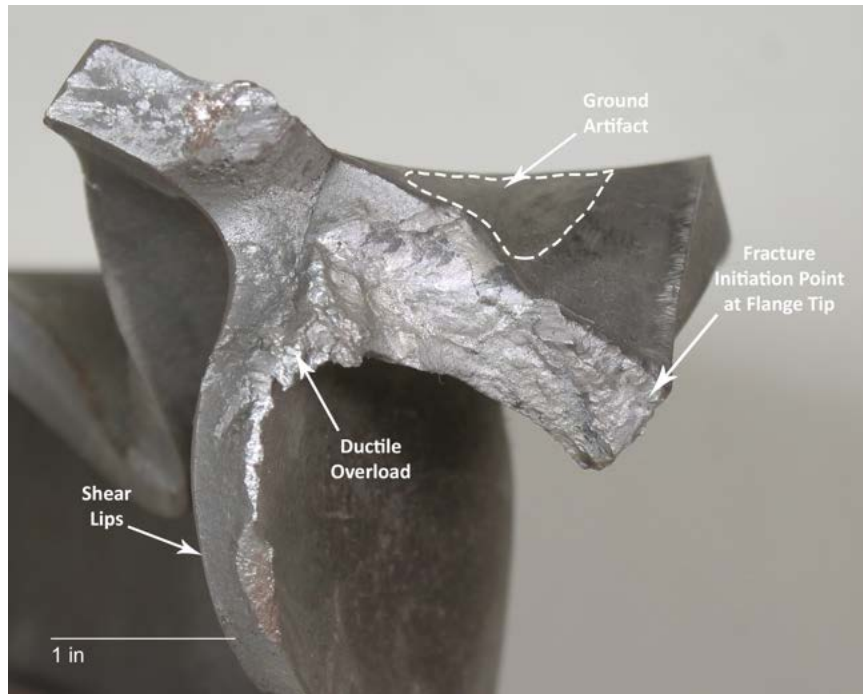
W24RBS-0.125NGT-T59 top flange fracture looking towards the end-plate.
